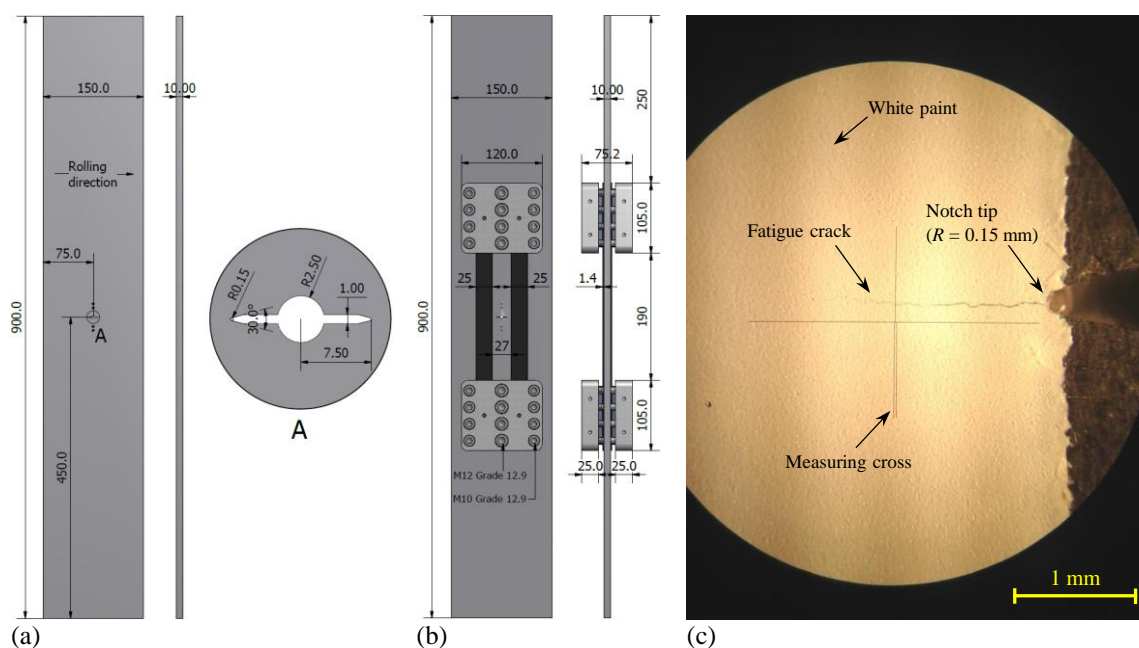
Specimen dimensions and notch details (all dimensions are in mm); (a) reference specimen; (b) PUR specimen; (c) microscopic view of the notch and fatigue crack in the reference specimen.
